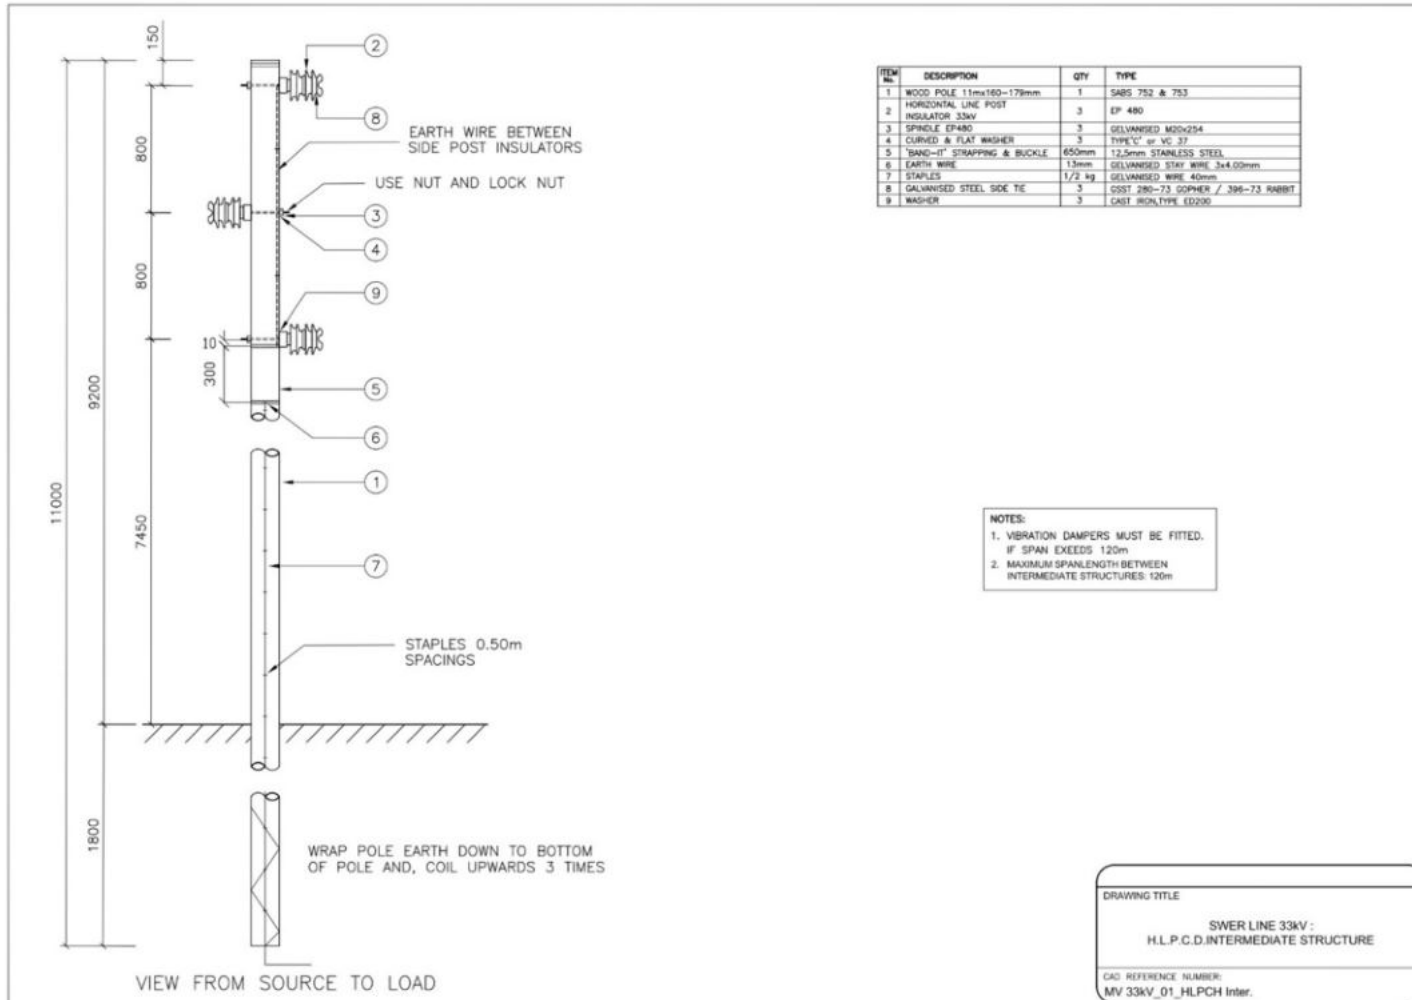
Details of proposed intermediate structures (alternative HLPCD Structures)
